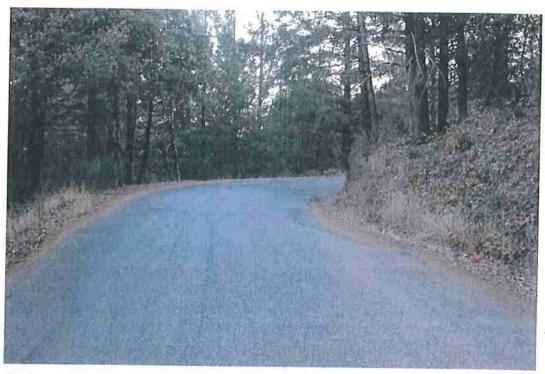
Mile 1.2: 20-ft road width with 1-ft shoulders.
